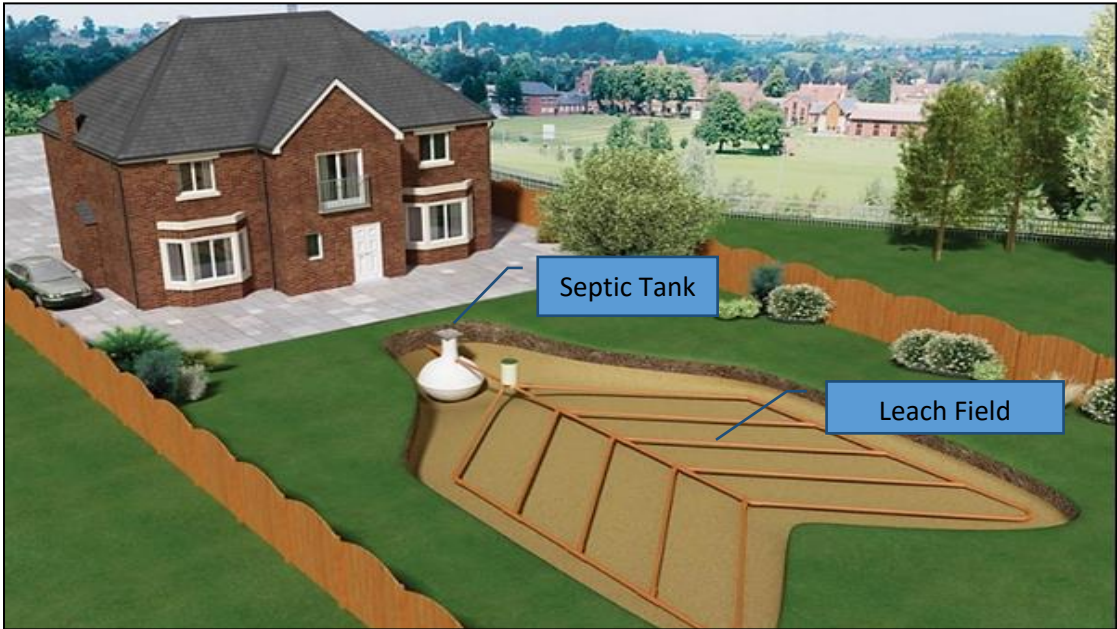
Sketch of an On-Site Wastewater Treatment System (OSWTS) (Source: <http://selfbuild.ie/>)
